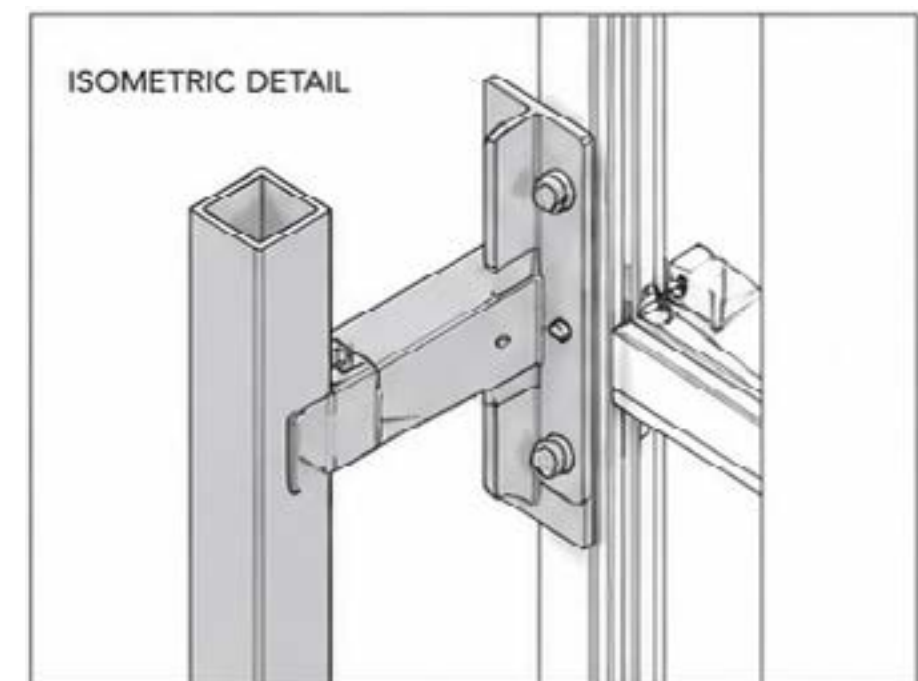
Typical connection detail between the proposed fog-harvesting support structure and the existing curtain wall mullio. Source: Diagramed by the Author
